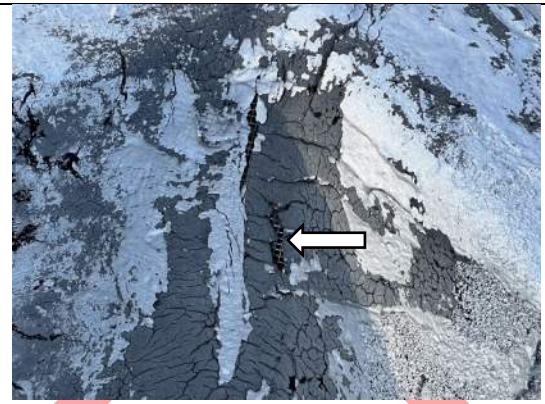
View of exposed reinforcing ply located at the roof above the western exit.
